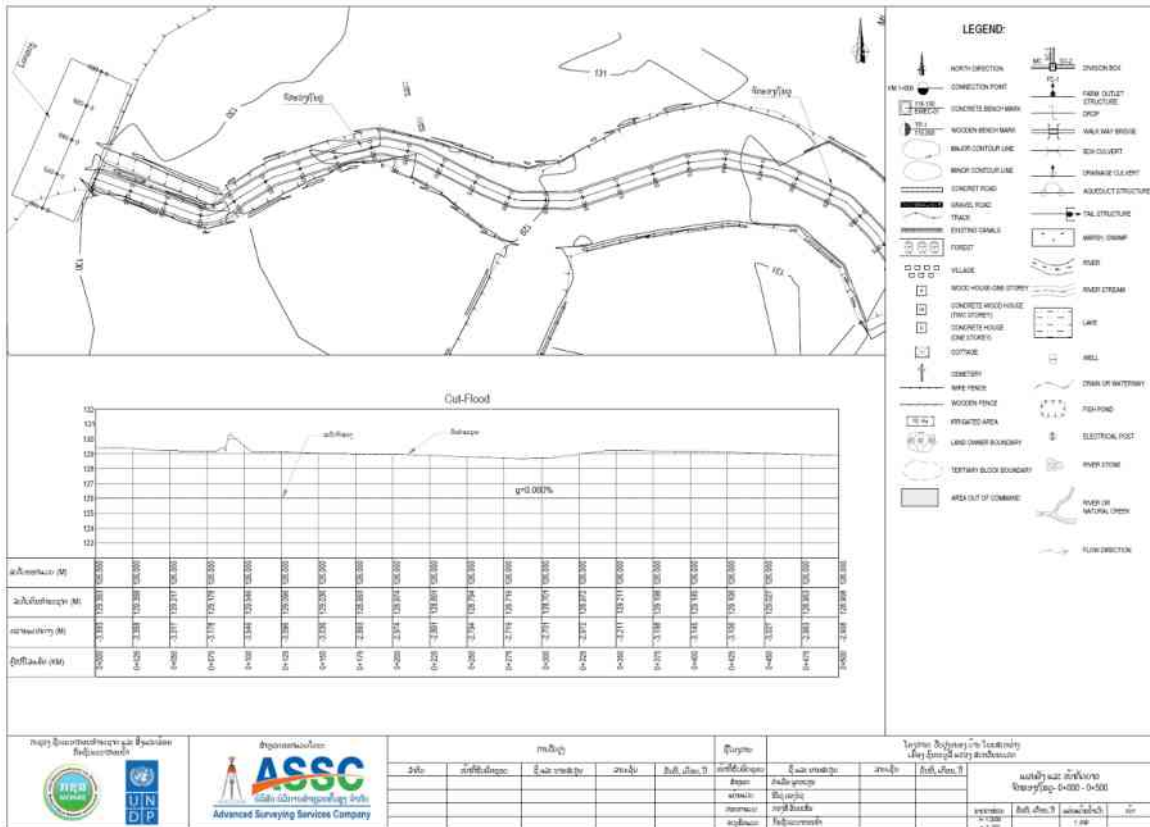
Plan profile and cross section of community Pond improvement in Nonsavang Village, Xonnabouly District
